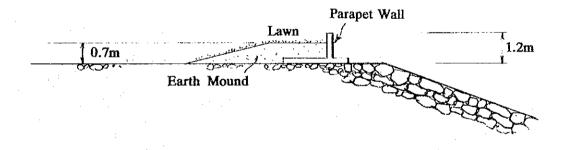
Typical Parapet Wall Arrangement (Earth Dike)
